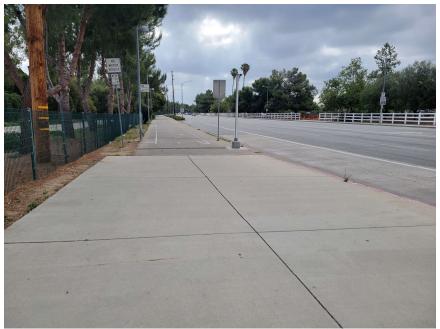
Overview of an underground section at Mason Avenue and Victory Boulevard, view to east, April 28, 2022
